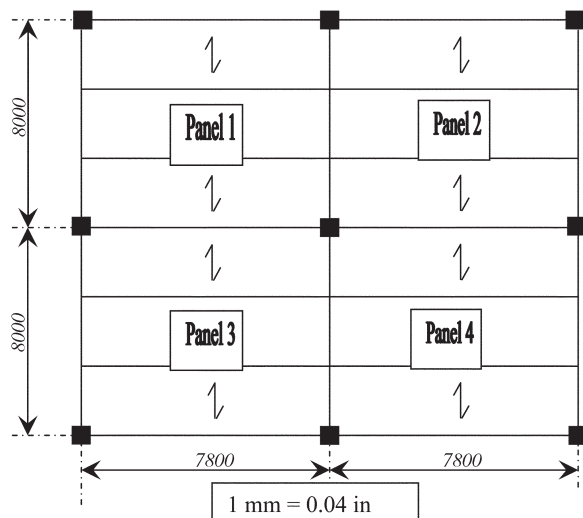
Configuration of four-panel floor model. (Note: Dimensions in mm.)
